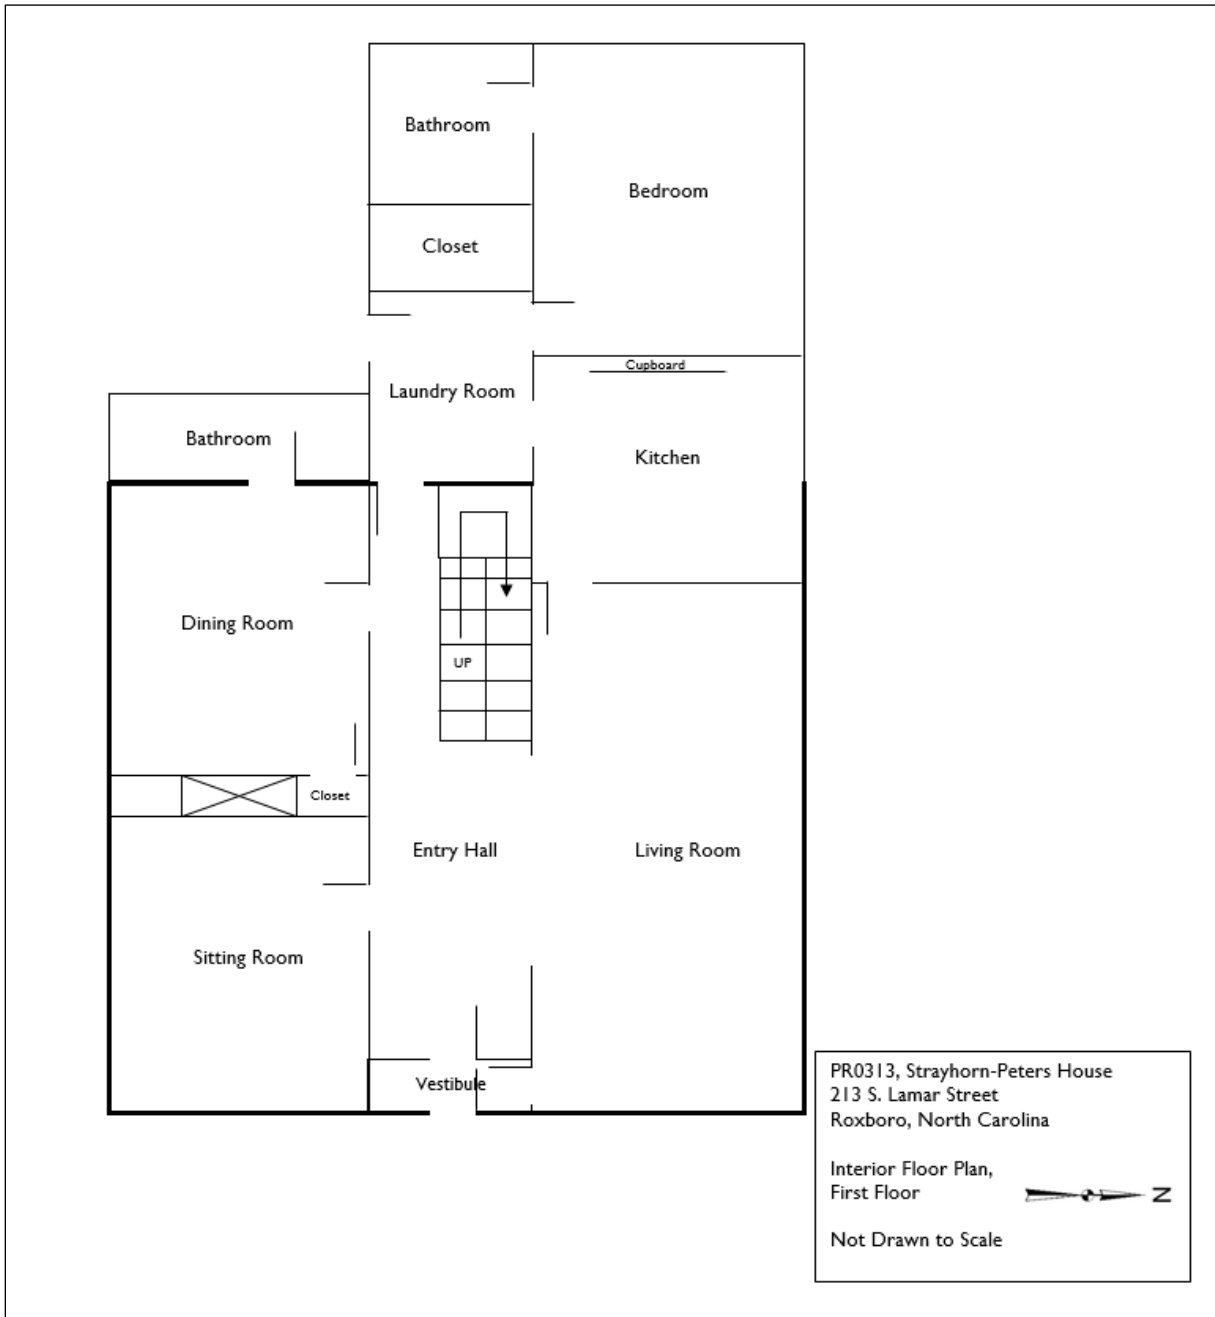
Interior First-Level Floor Plan of Strayhorn-Peters House.
